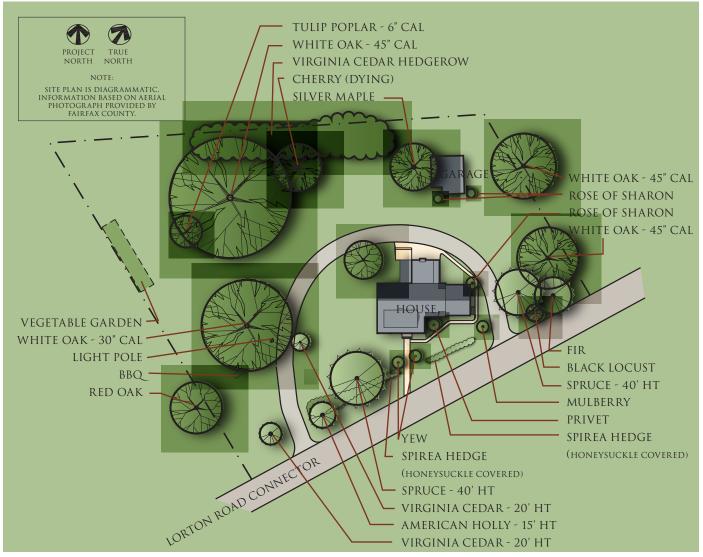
The Existing Conditions Site Pan shows the house oriented to the Lorton Road Connector and within a well-planted site.
